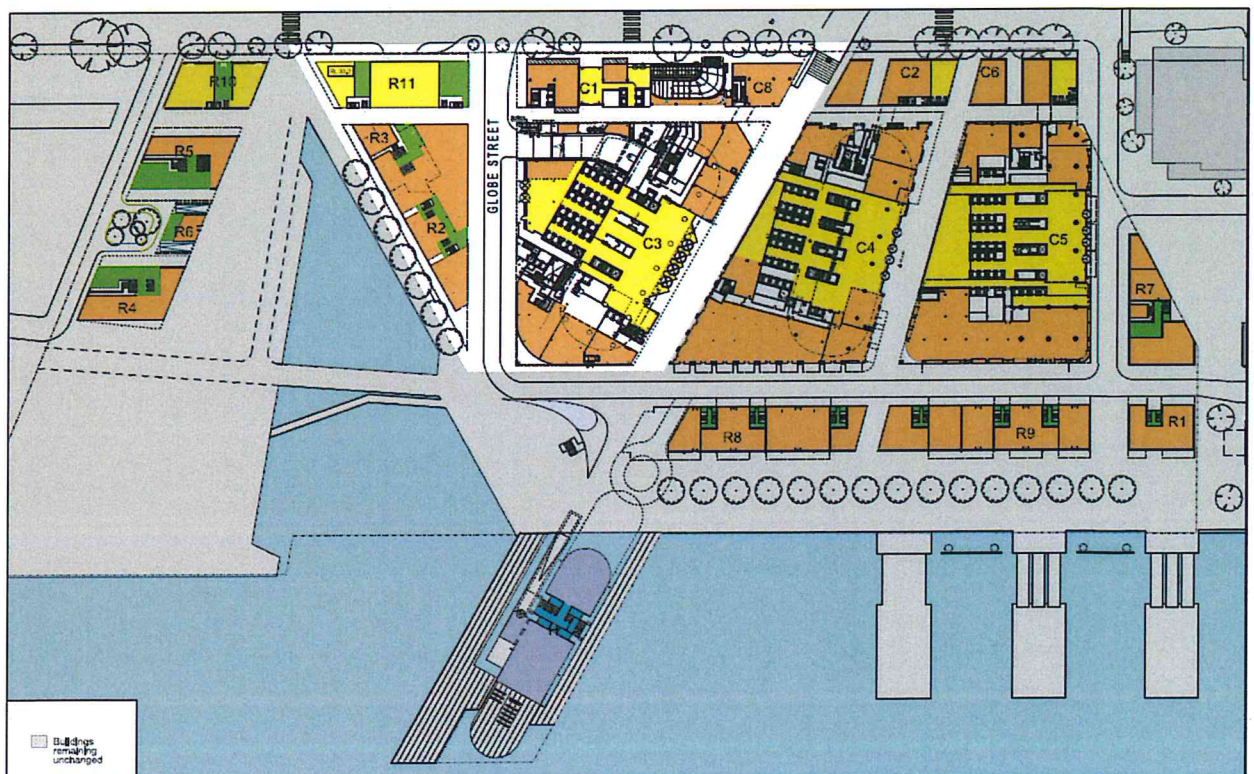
Ground floor layout of the blocks as proposed under MOD 6 (Source: Lend Lease).
